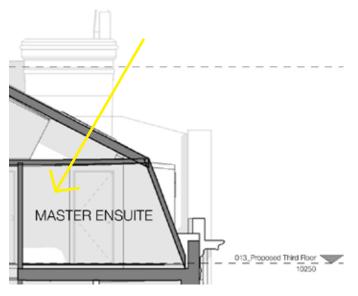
Proposed boxing-out of ceiling to master ensuite to receive light from roof plane
